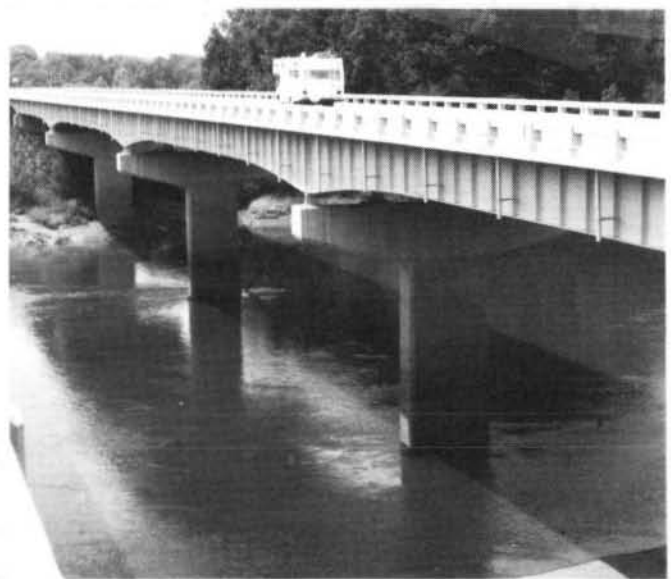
I-20 HIGHWAY BRIDGES (R.M. 65.9)
